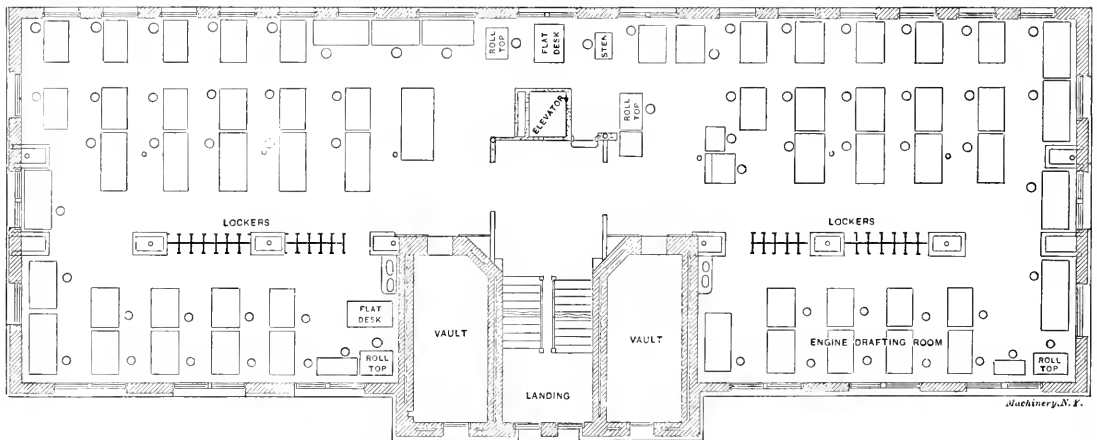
Plan of Third Floor of Office Building, which is Occupied by the Drafting Room.
